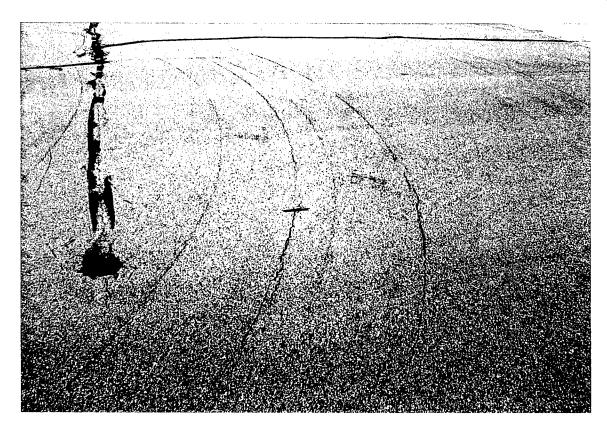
Cracks caused by turning C-130 on Runway 13-31
